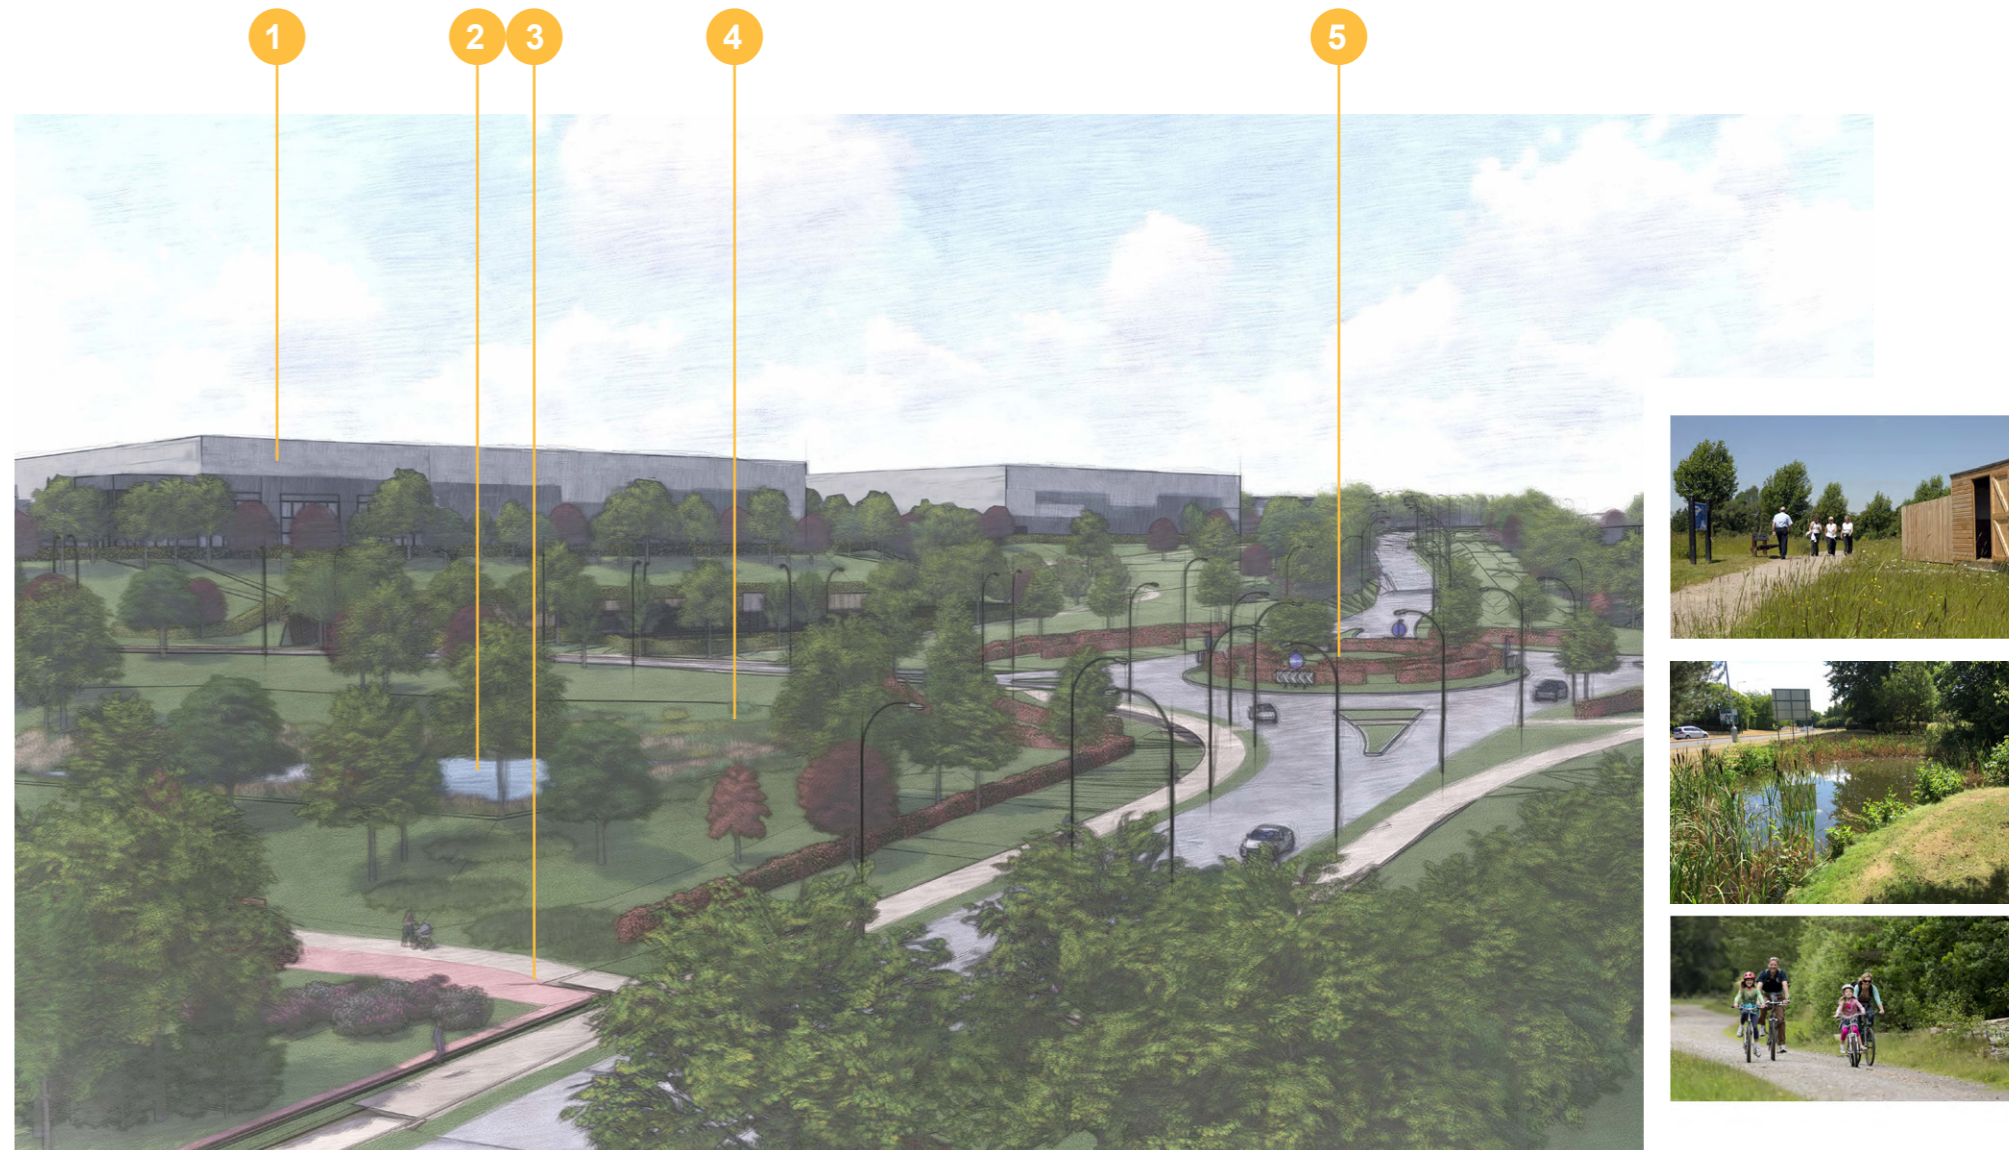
Proposed connection between proposed Employment Area and existing footpaths/Public Right of Way
